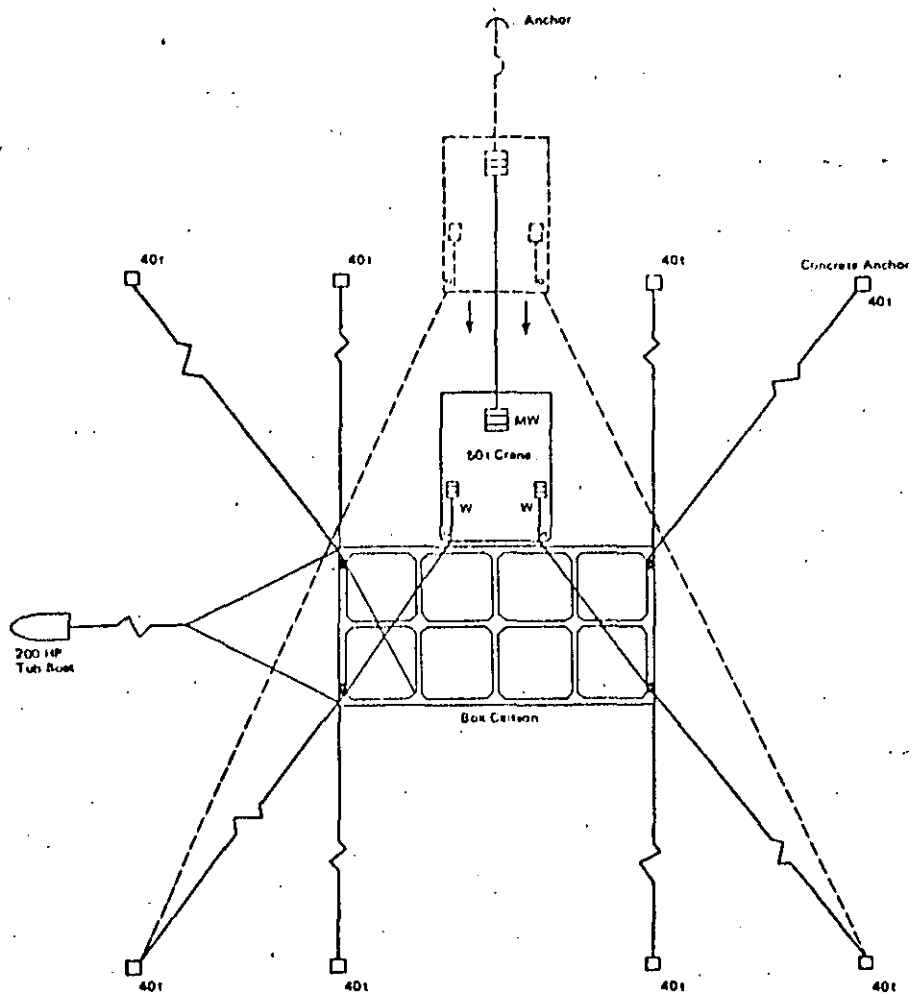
Setting Operation of Box Caisson by Crane Barge (In Case of 1st Caisson)
